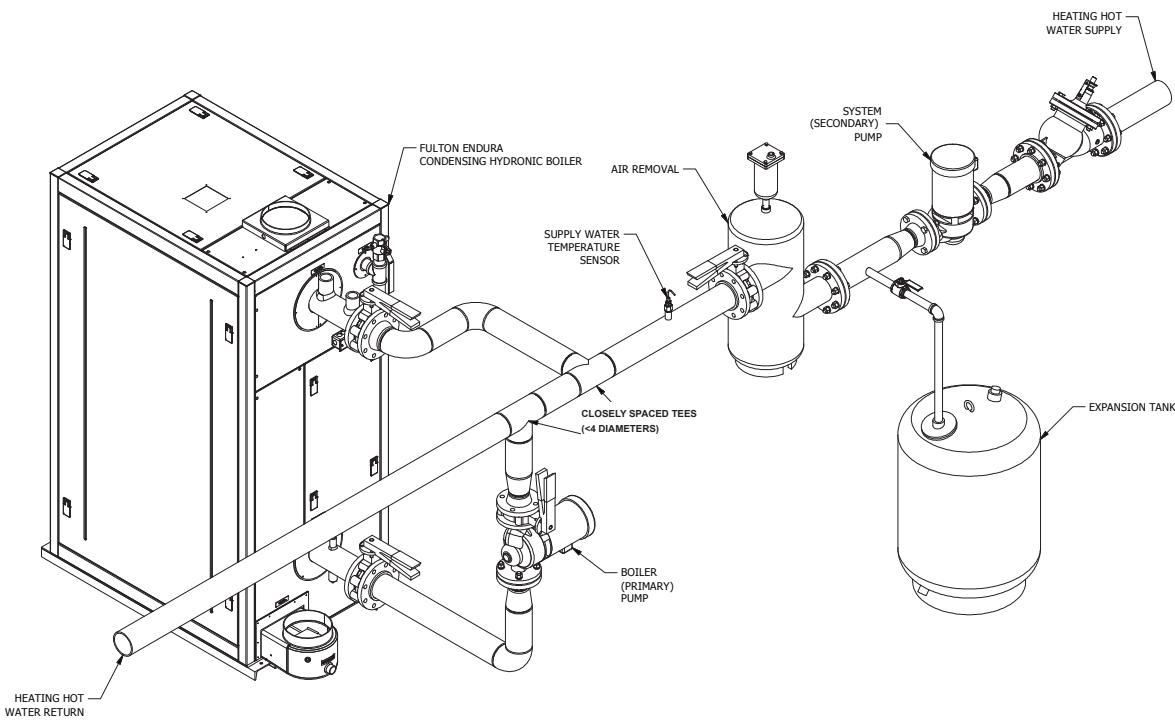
SAMPLE PIPING LAYOUT, PRIMARY - SECONDARY PIPING; SINGLE BOILER
